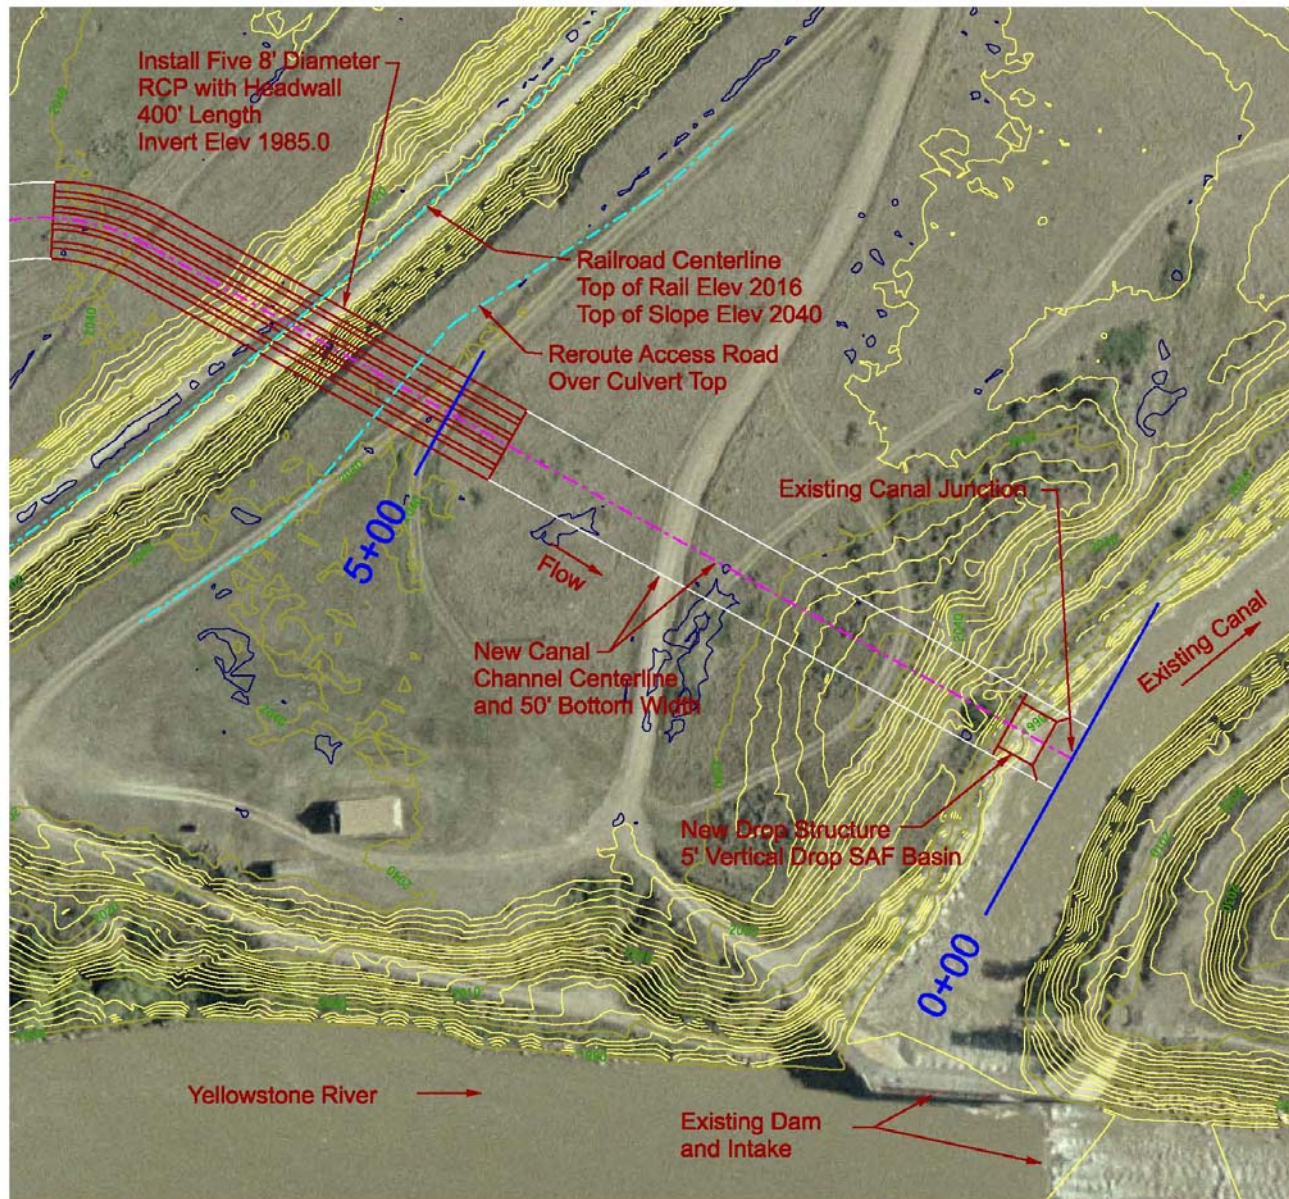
New Railroad Culvert Crossing, Station 6+30.
